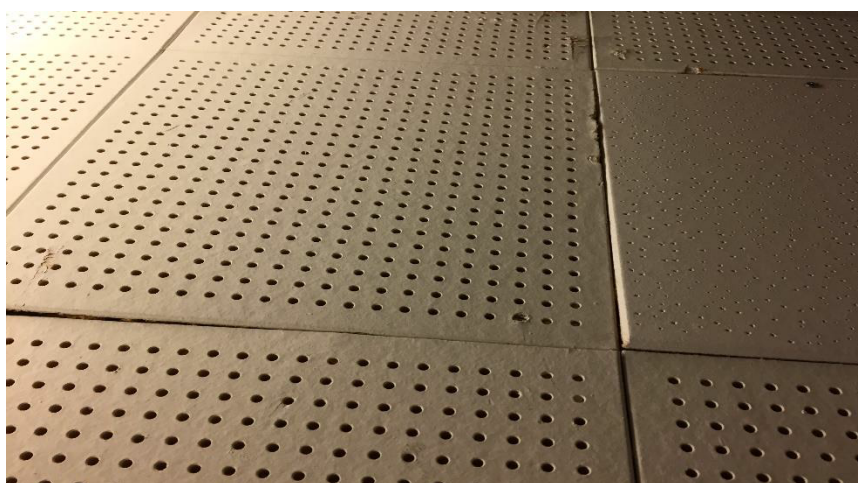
View of non-asbestos-containing ceiling tiles observed throughout the basement of the subject building.
